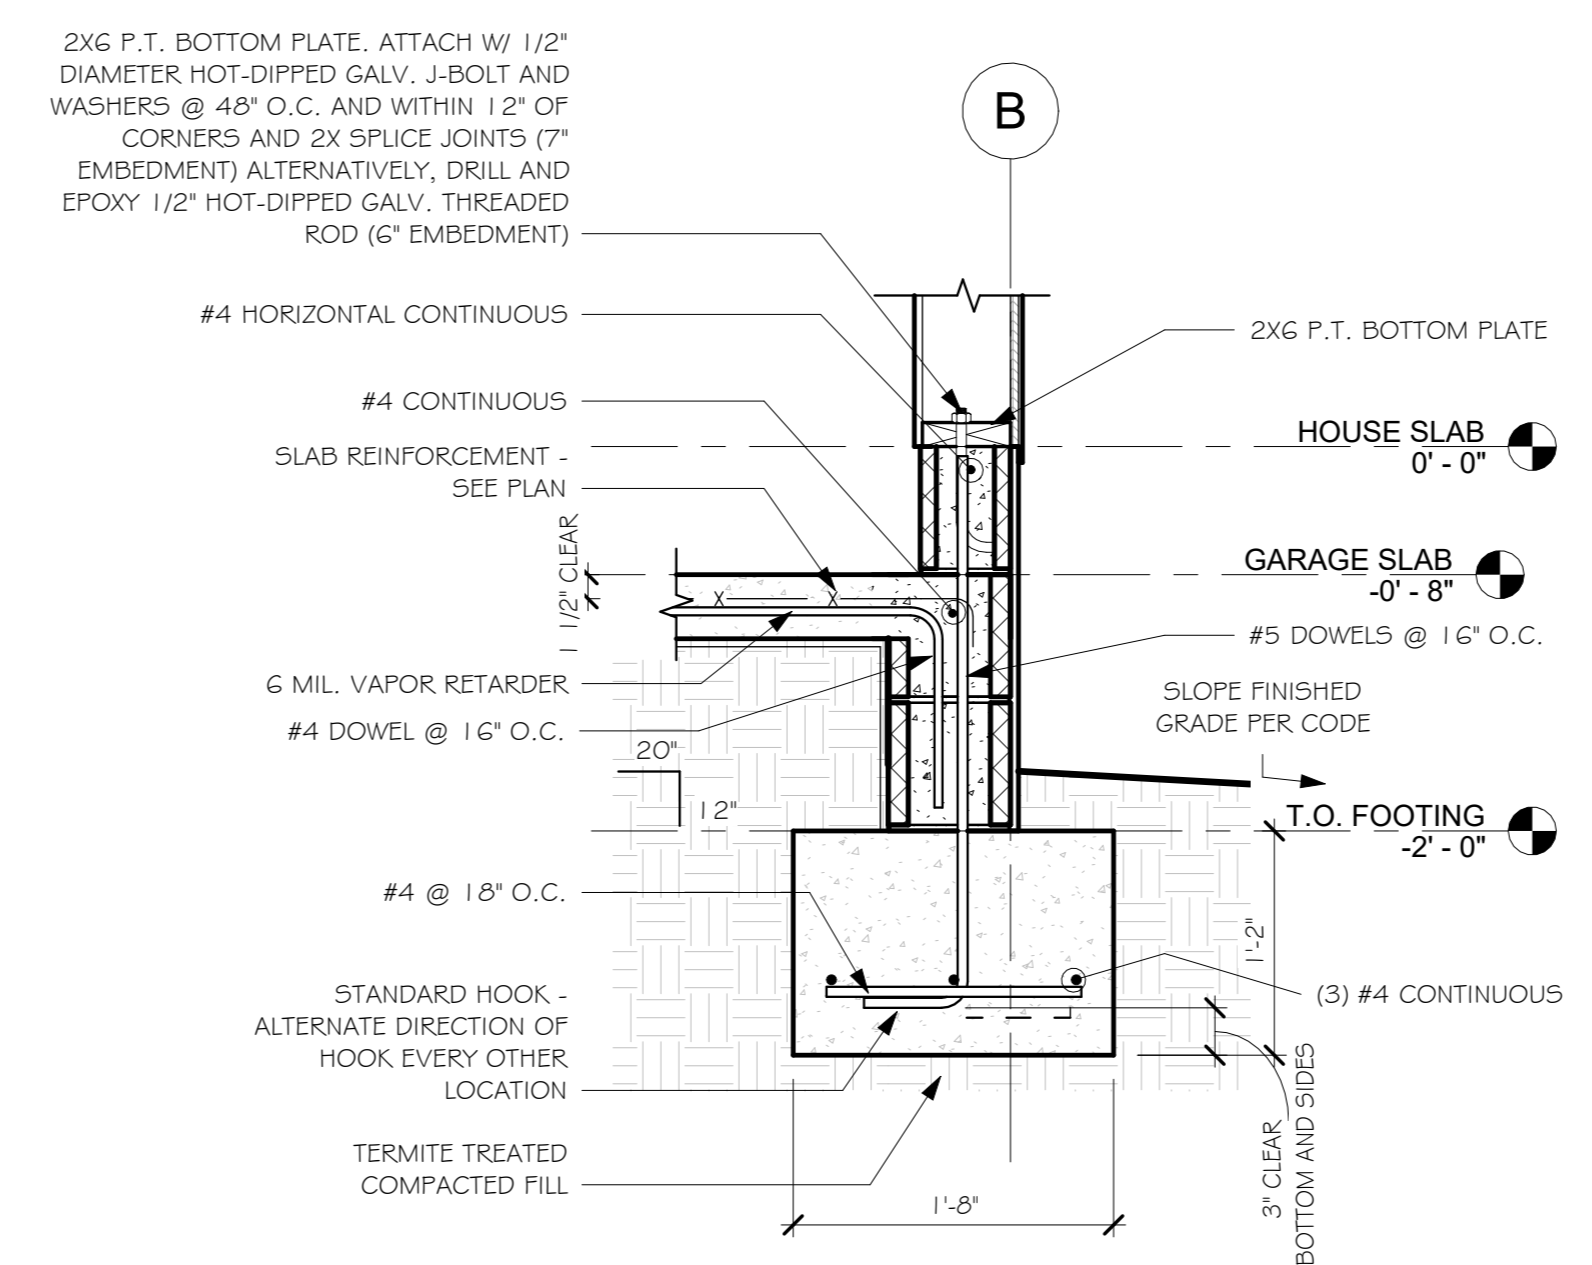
FOOTING @ HOUSE AND PORCH
